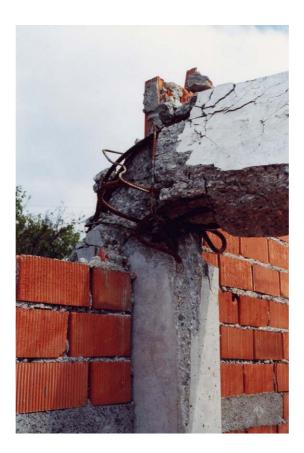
Failure of column at lap splice connection and at top of infill wall (1999 Kocaeli earthquake)
